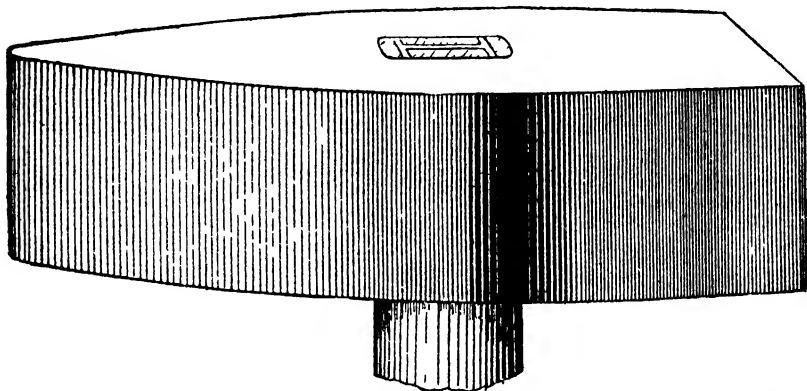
,530 —Face hammer. Used for the same purpose as the double face hammer where less weight is required. The cutting end is used for roughly squaring stones preparatory to the use of the finer tools.
